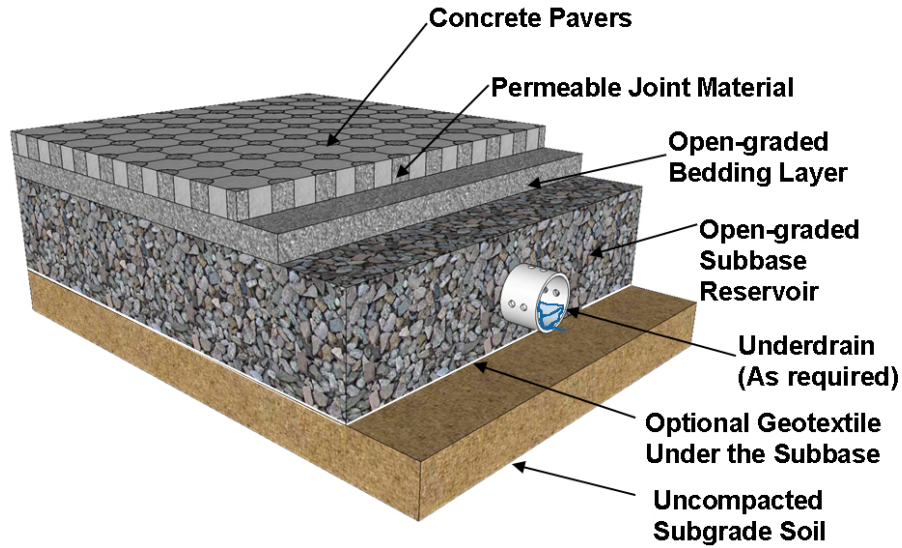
Schematic cross-section of permeable pavement (courtesy Matthew Jones, NCSU).
